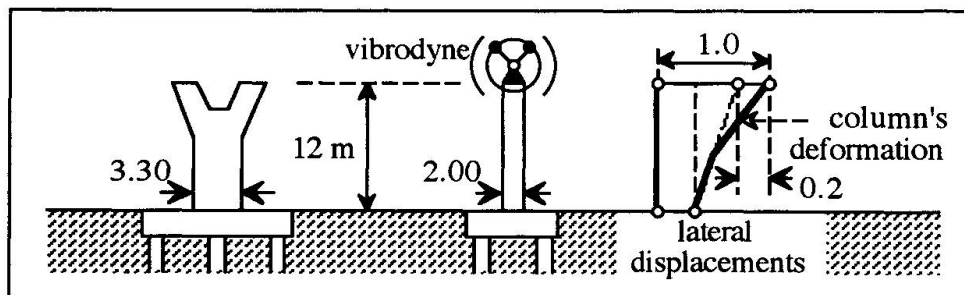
Dynamic test of a pier before the construction of the deck structure
